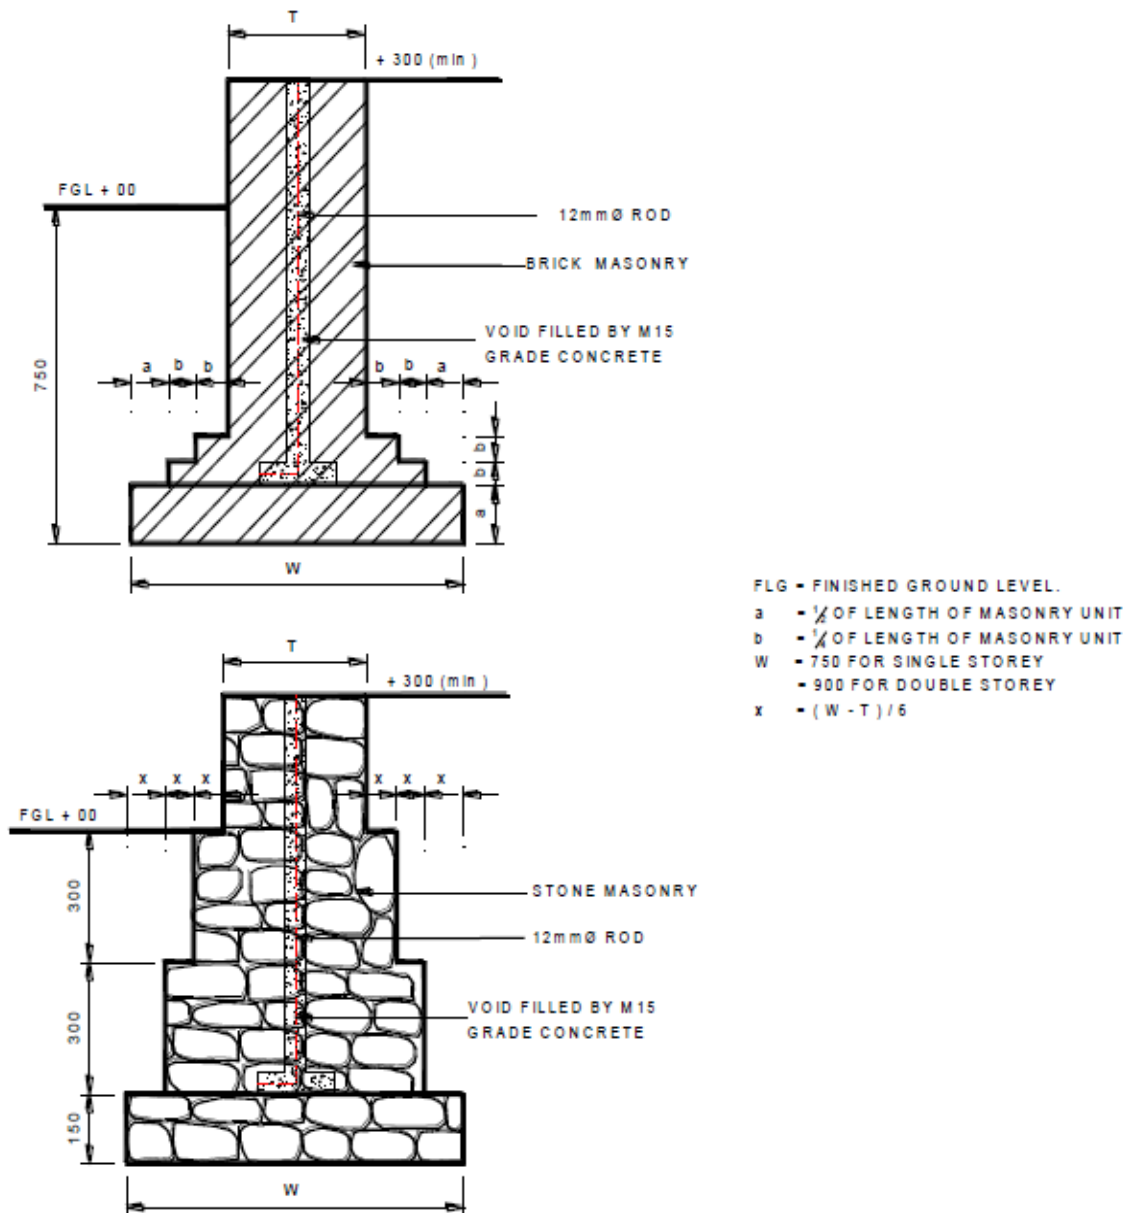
Details of Strip Footing Masonry Foundation (where cement and concrete available)
